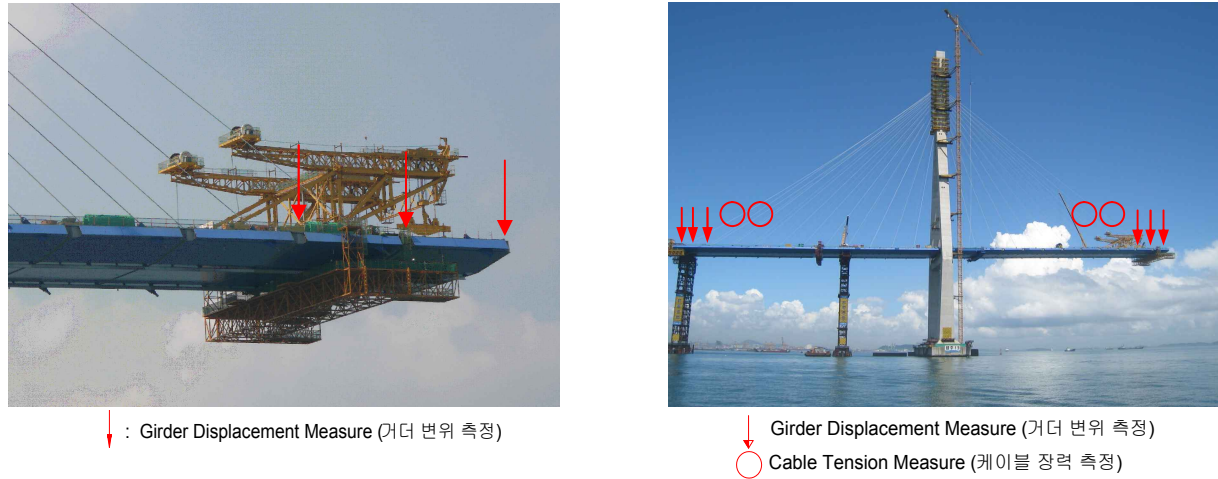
Geometry Control Plan : Small-Segment Joint & Cable Tensioning
